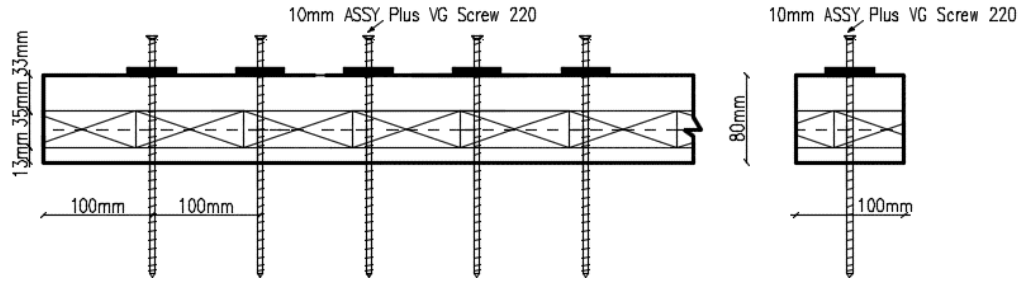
Series 5 layout: side section (left) and cross section (right)
